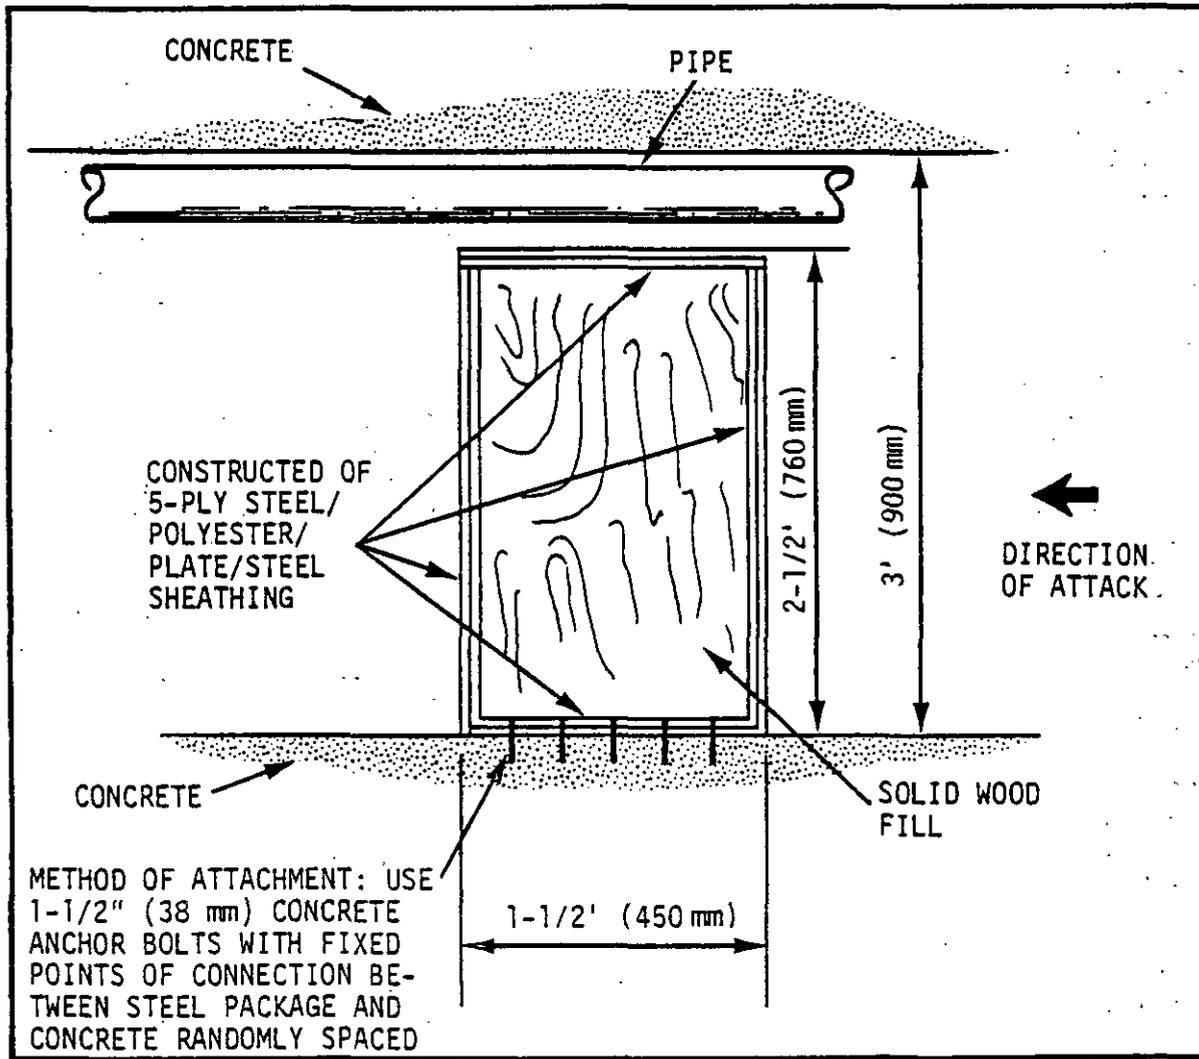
Representative constricted pipe chase, cross-sectional elevation view.
